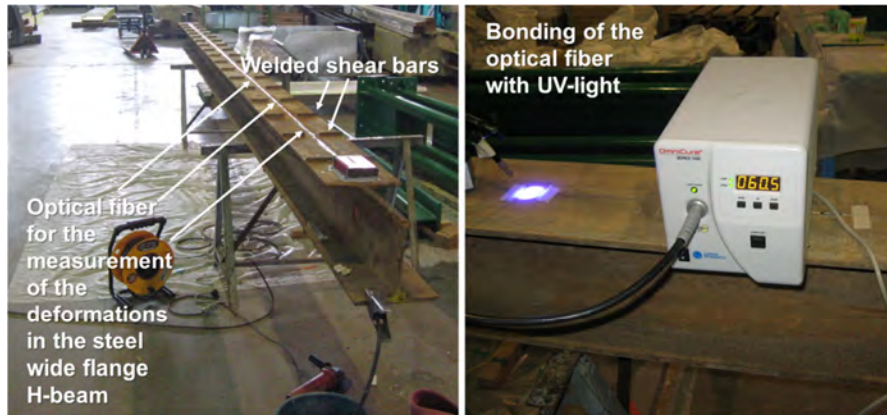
Bonding of the optical fibers on the two opposite flanges of a steel wide flange H-beam (type HEA) in the laboratory facilities of BBRI
